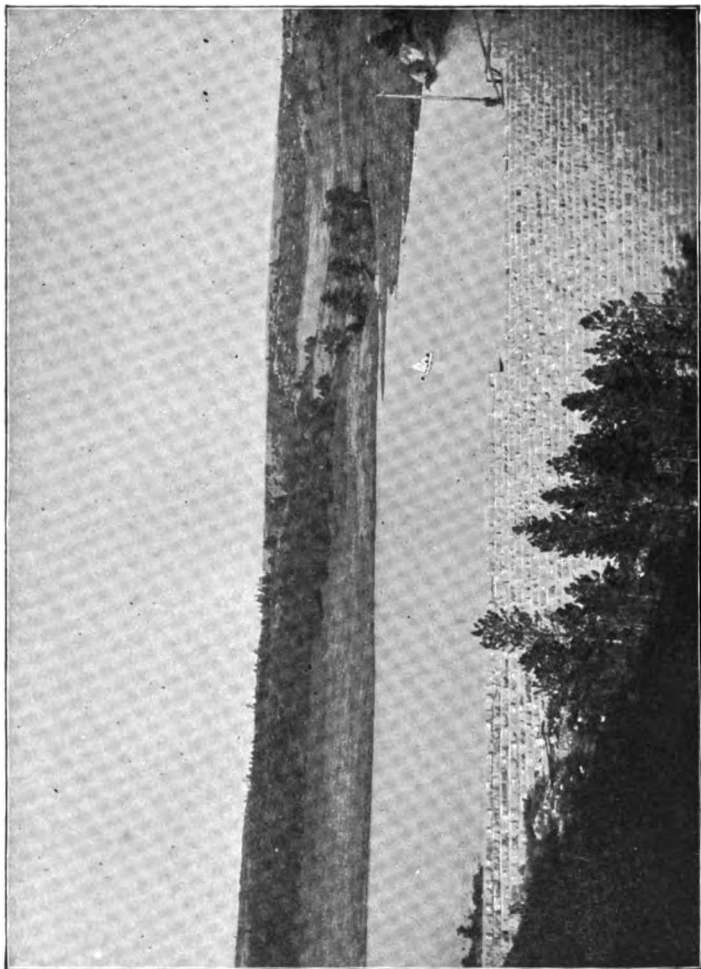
VIEW OF CASTLEWOOD DAM AND RESERVOIR, COLORADO.
